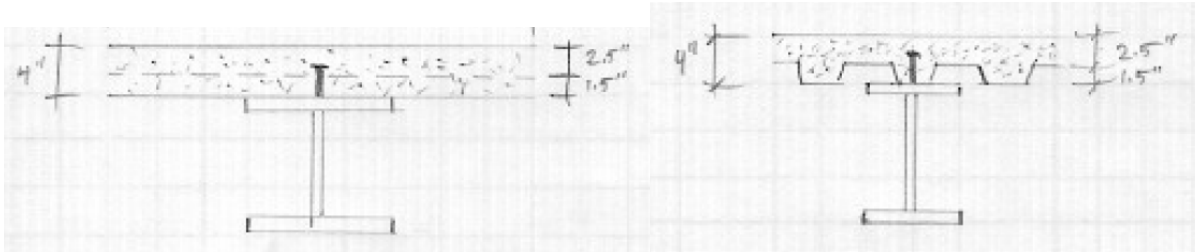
(Left) Section through Beam. (Right) Section through Girder
